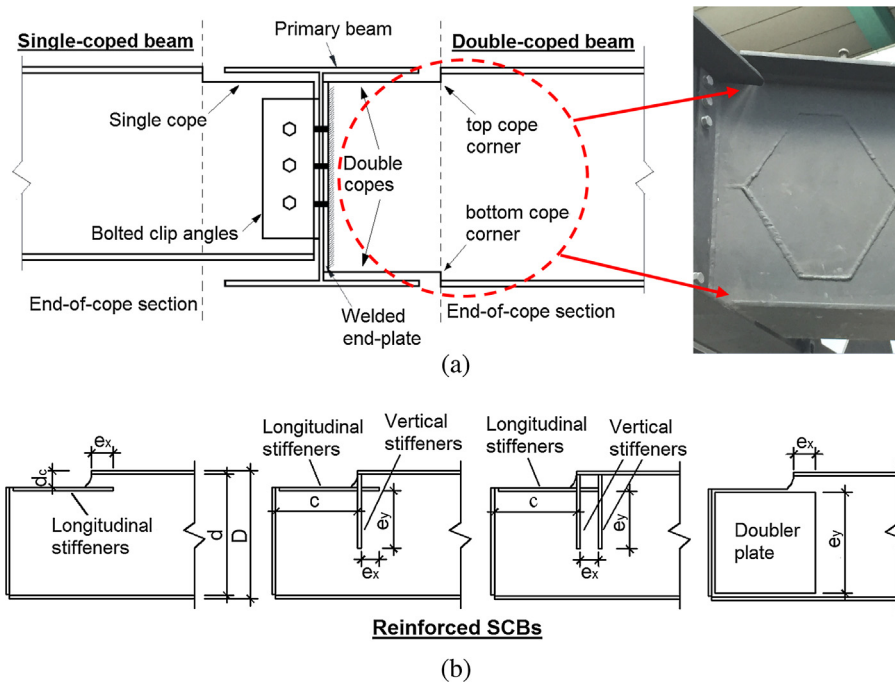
Coped beam connections: a) practical coping details of steel beams, b) typical reinforcement for SCBs.
